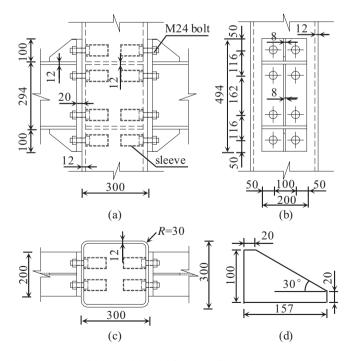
Dimensions of the tested joints: (a) front view; (b) lateral view; (c) vertical view; (d) details of the extended stiffeners (units: mm).
